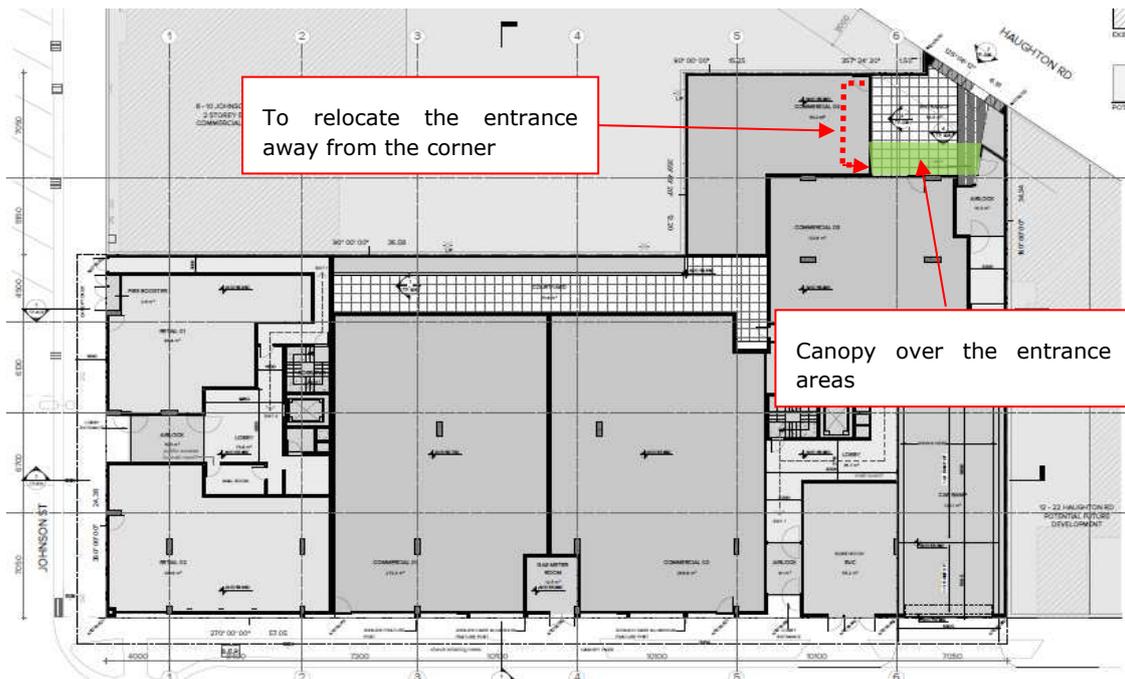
Ground floor plan with the recommended wind control measures overlaid
